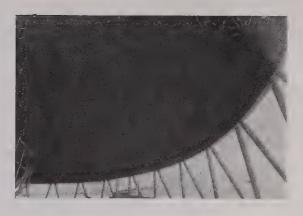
Internal Scaffolding arrangement to Cooling Towers.
